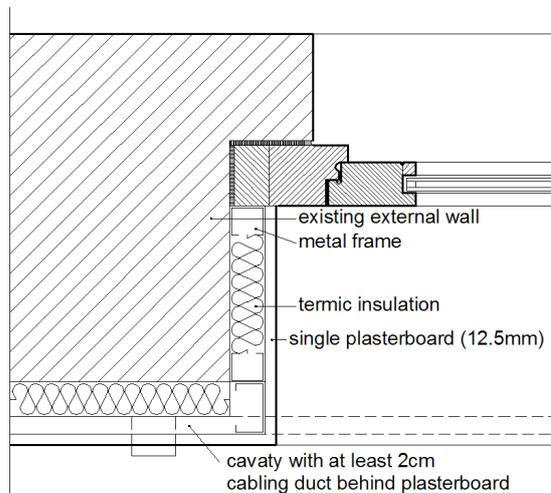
Insulation attached to the interior panel of the façade allowing cables to be laid behind the plasterboard wall.
